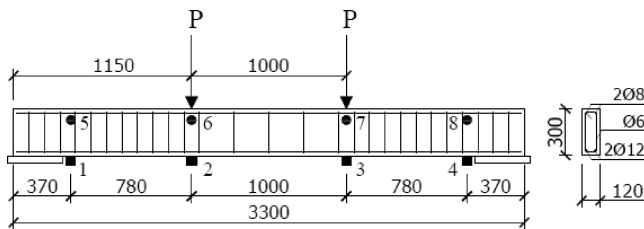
Diagram of the bending test and the scheme of reinforcement structure for a single-span beam with AE sensor spacing
